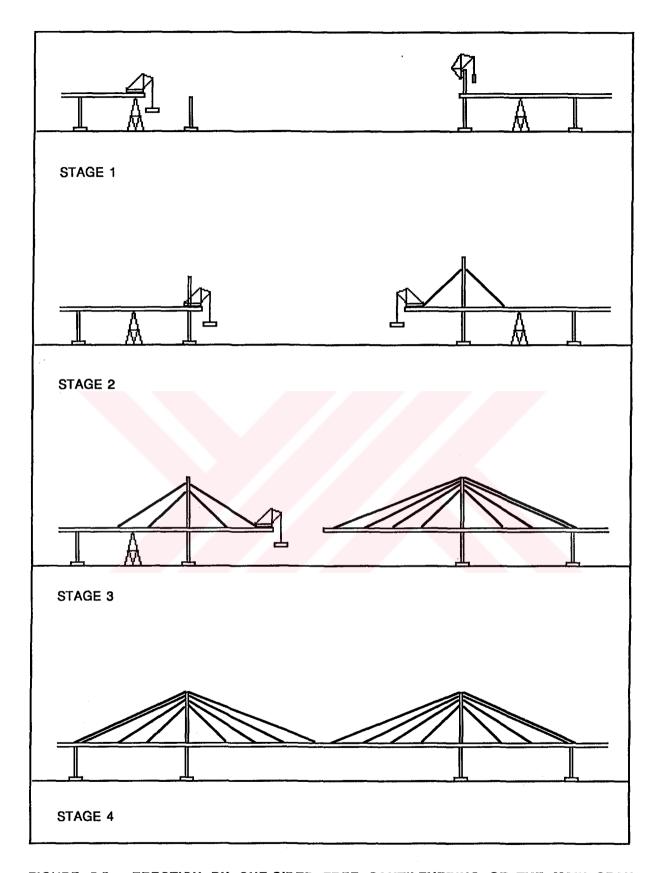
ERECTION BY ONE-SIDED FREE CANTILEVERING OF THE MAIN SPAN
